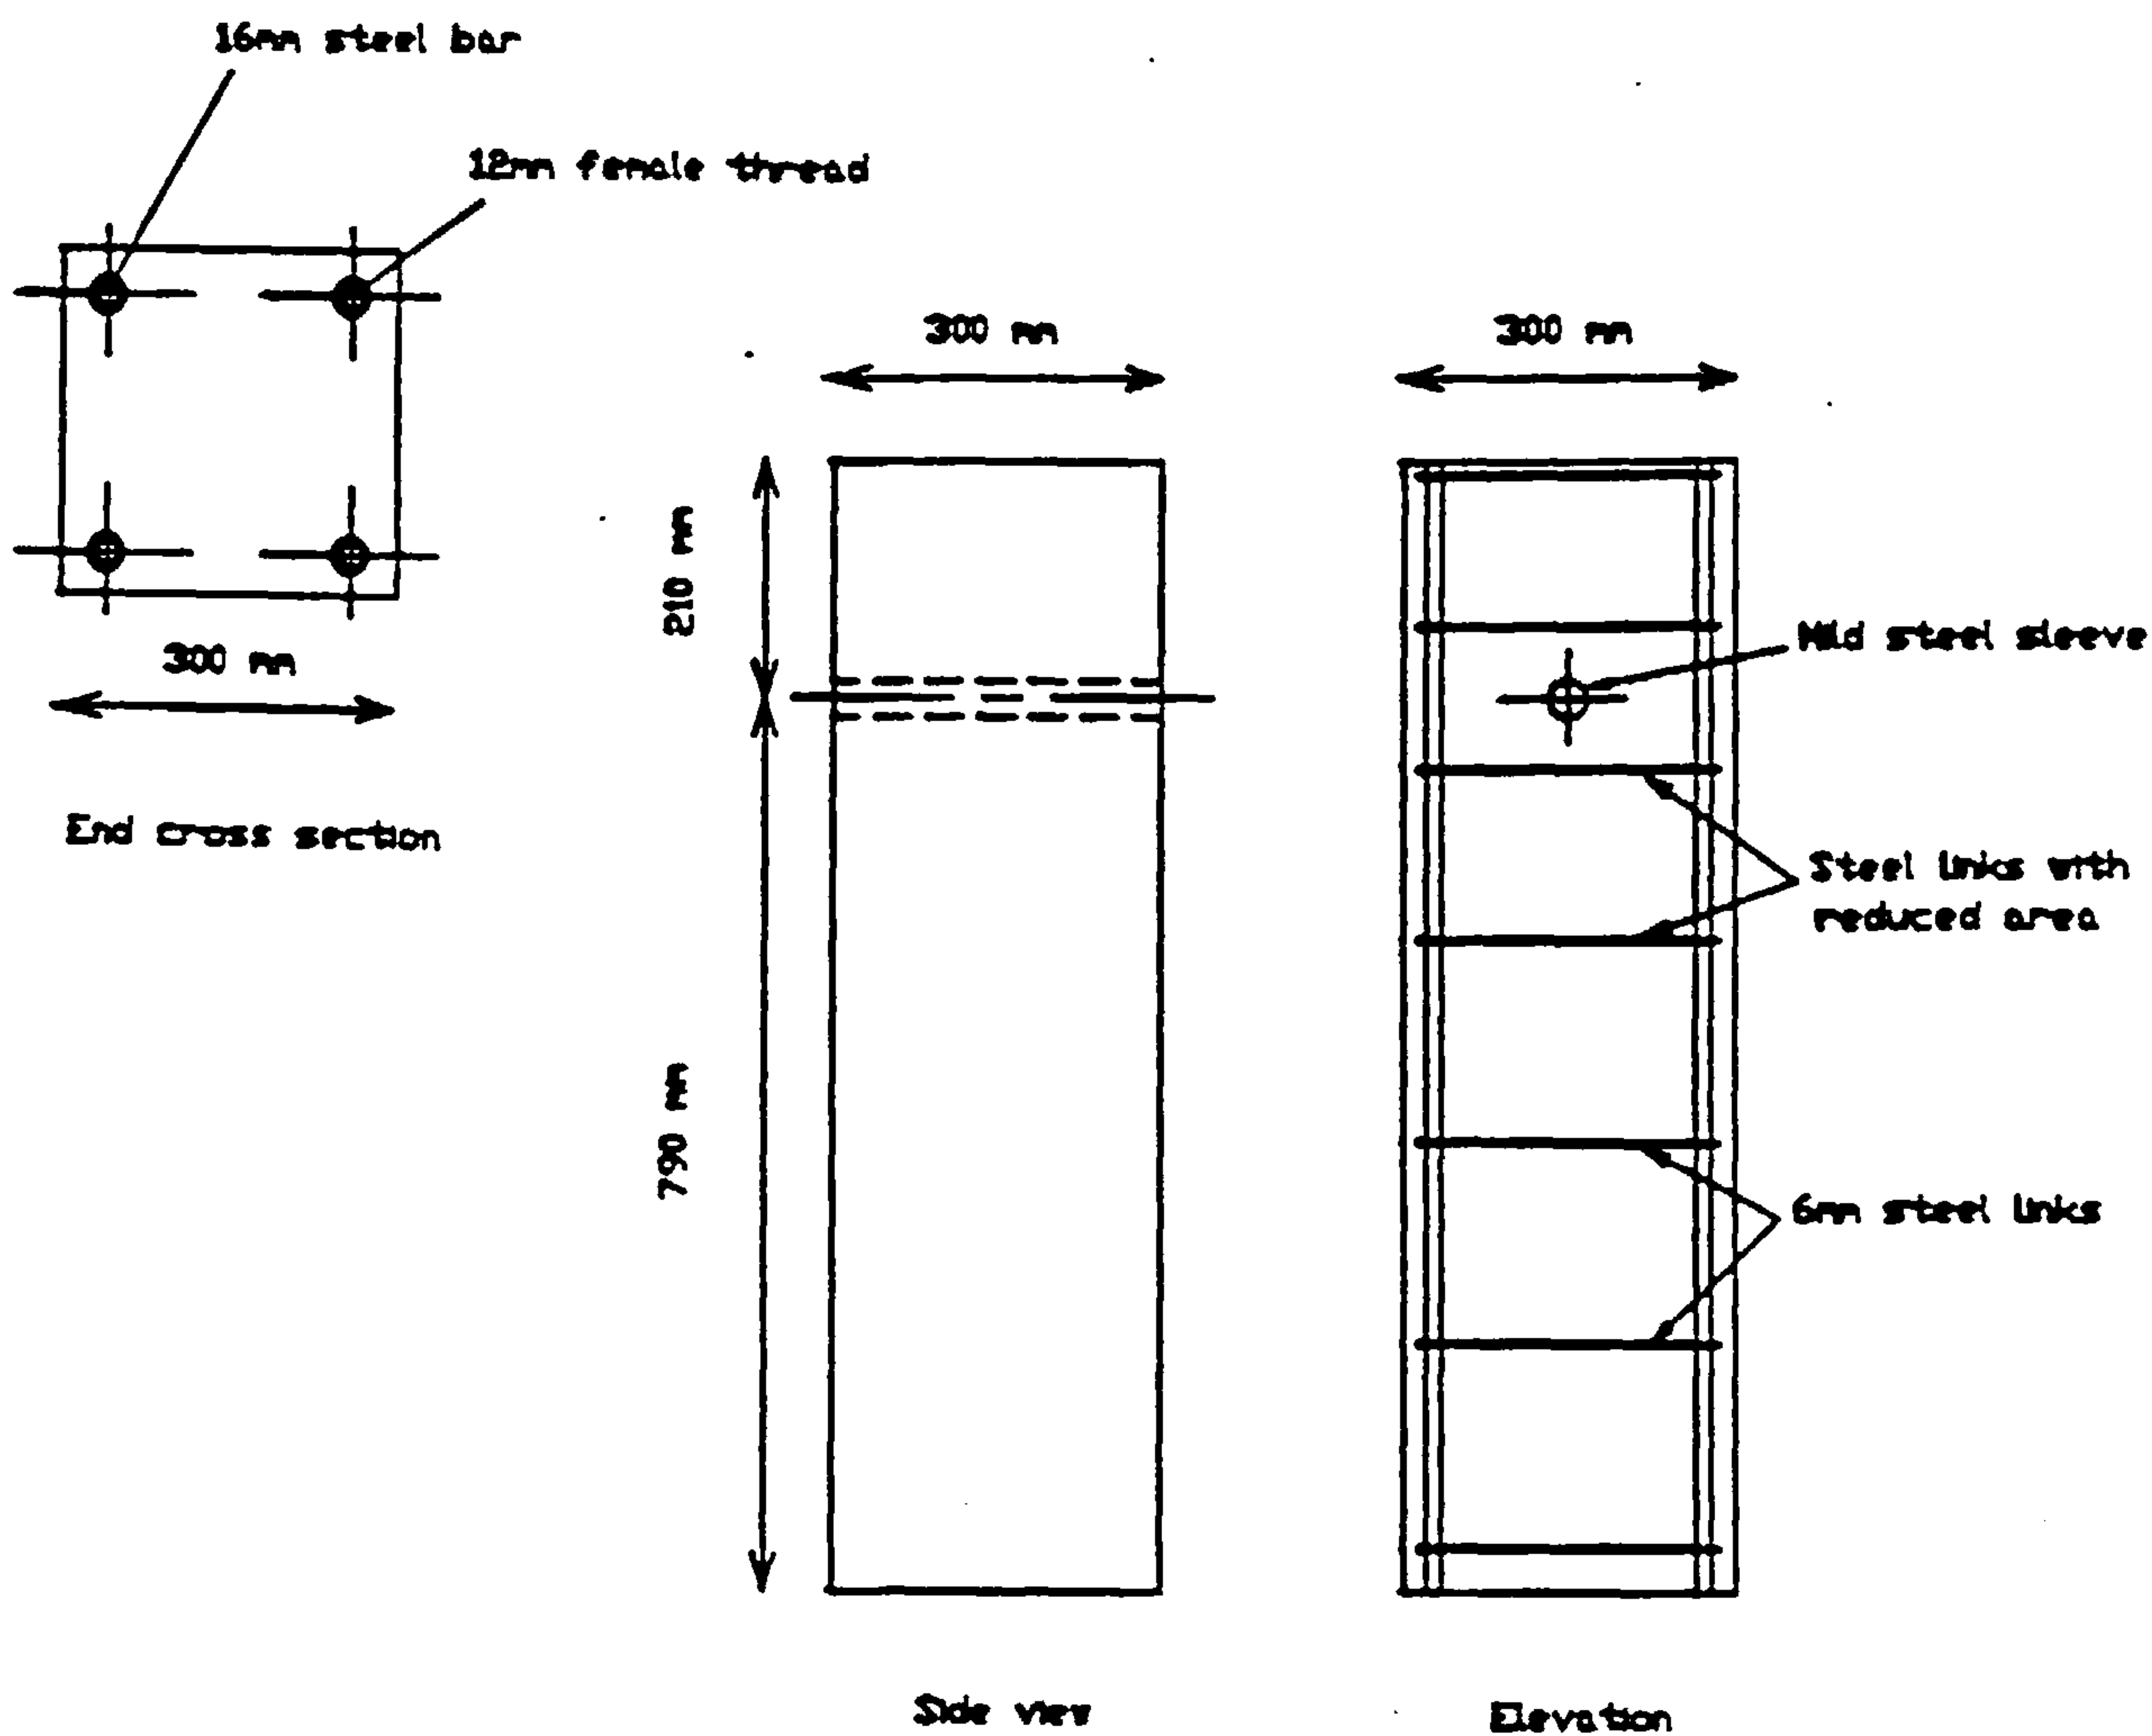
DIMENSIONS OF THE TEST SPECIMEN WITH DETAILS OF REINFORCEMENT.
